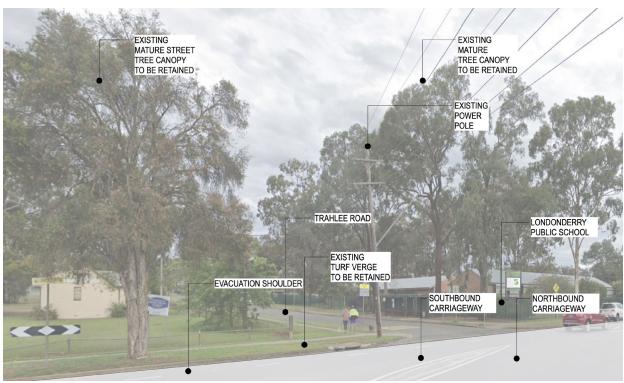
Viewpoint 9 - Intersection of Torkington Street and Londonderry Road (facing east) - Proposal view
